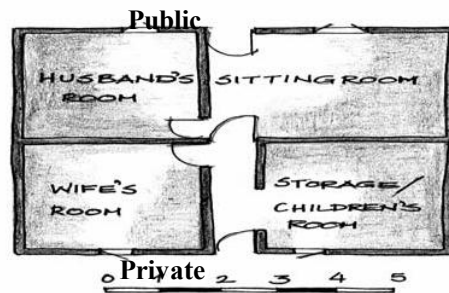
The floor plan of the house in figure 1, Mbuya. (Sketch: Nnaggenda-Musana, 2004)
